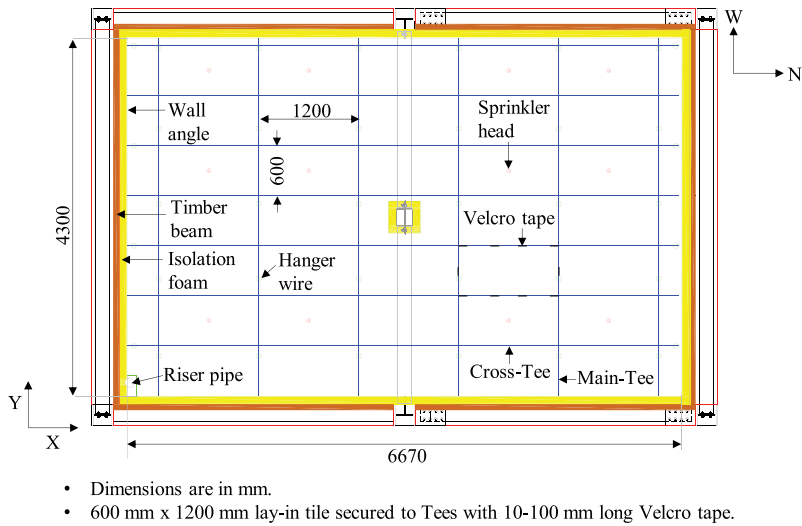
Fully-floating ceiling suspended from level 2 of the tested building redrawn from Rashid (2022).
